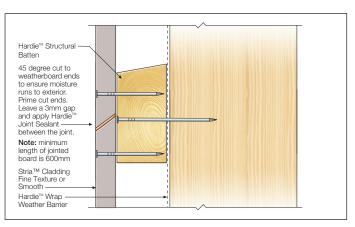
VERTICAL BUTT JOINT DETAIL
